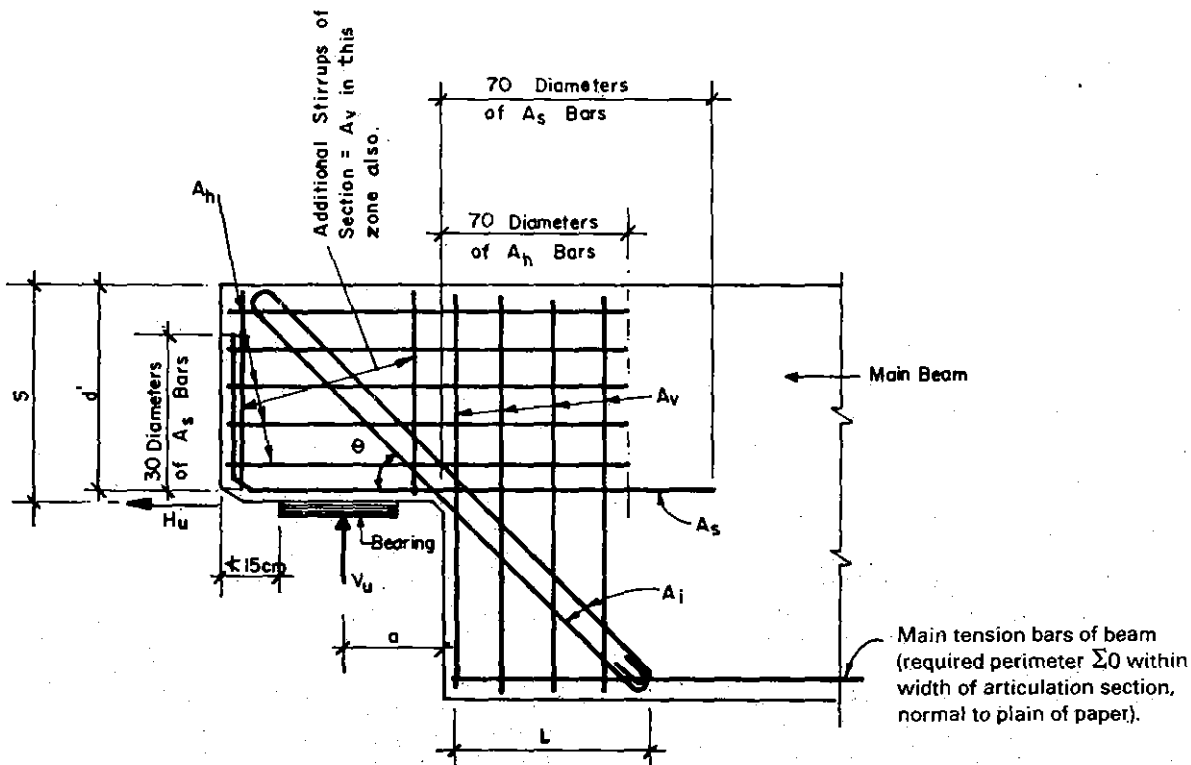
Detailing of A_i , A_s , A_v and A_h reinforcements in an articulation (other reinforcements not shown, main tension bars of beam only indicated).
